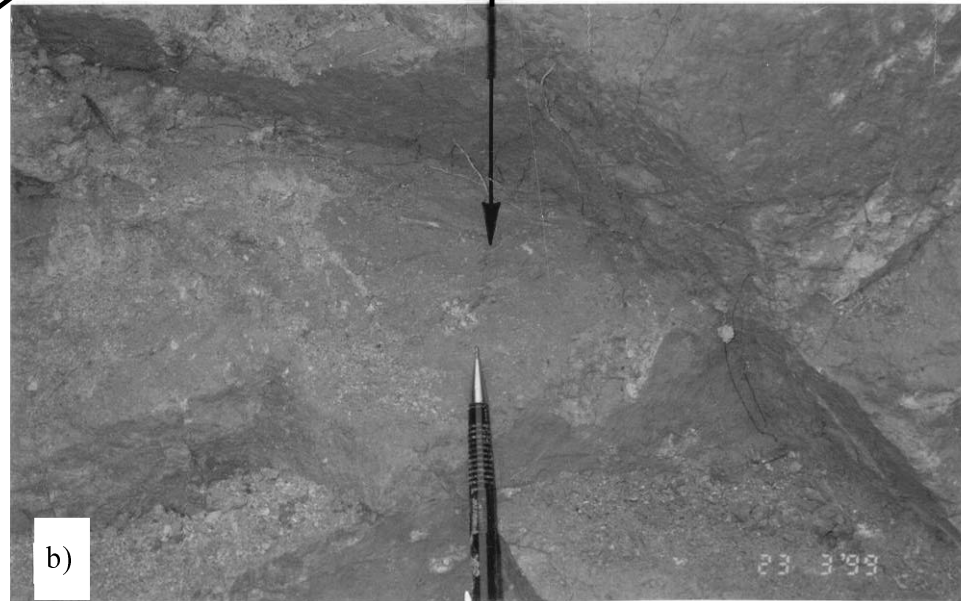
View of Face B, Trial Pit TP7 Showing Cracking within H-MDT
